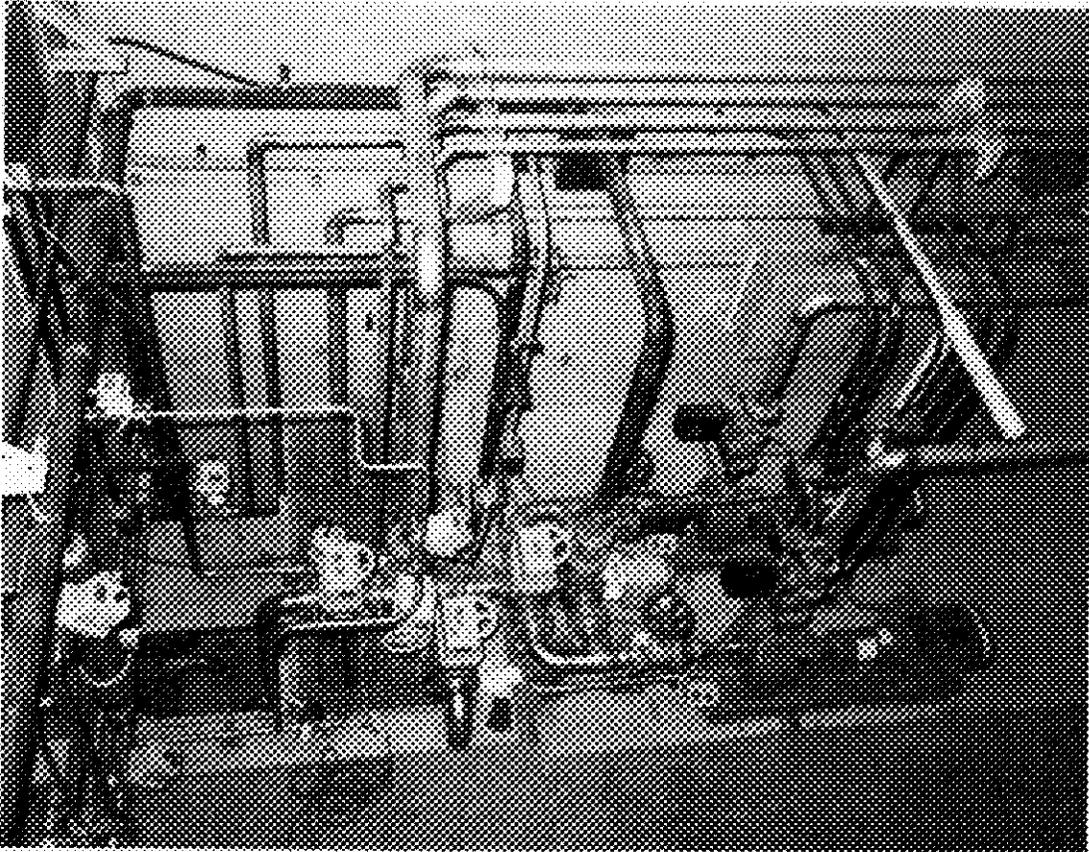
204-AR Waste Unloading Facility, Unloading Room.
